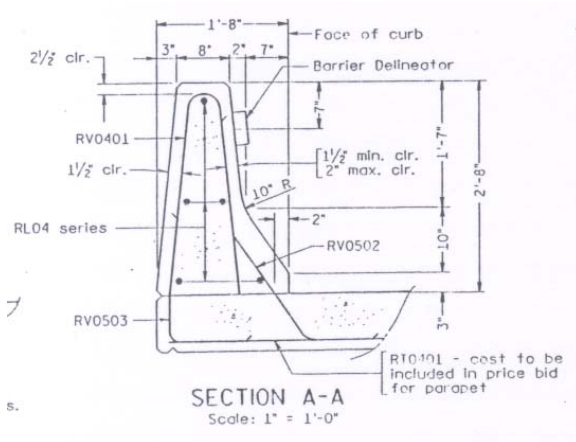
The actual cross section of the parapet of the steel girder bridge [Brown, 1993]. The 1" = 1'-0' scale is no longer correct.
